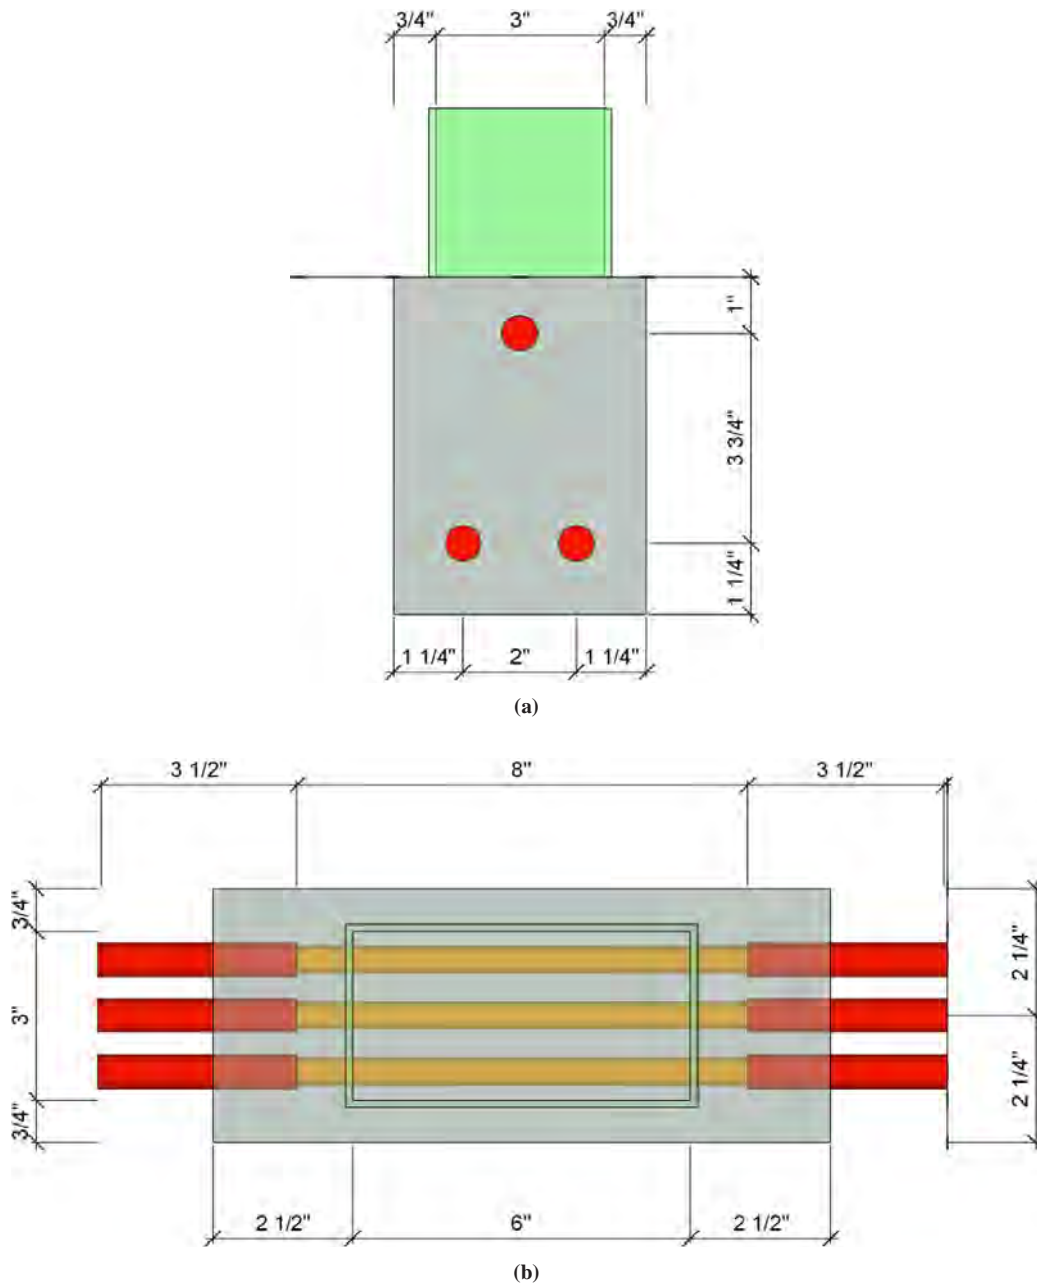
(a) Front and (b) top views showing dimensions of specimens for corrosion-resistance testing. Green area in front view is a dam.
